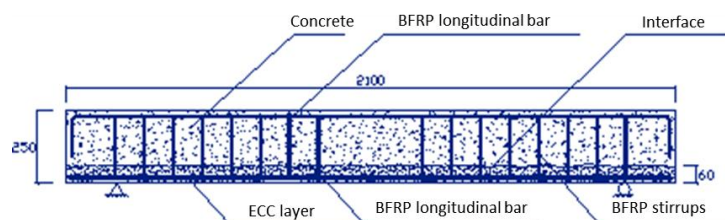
Full FRP bar reinforced concrete beam with ECC layer
